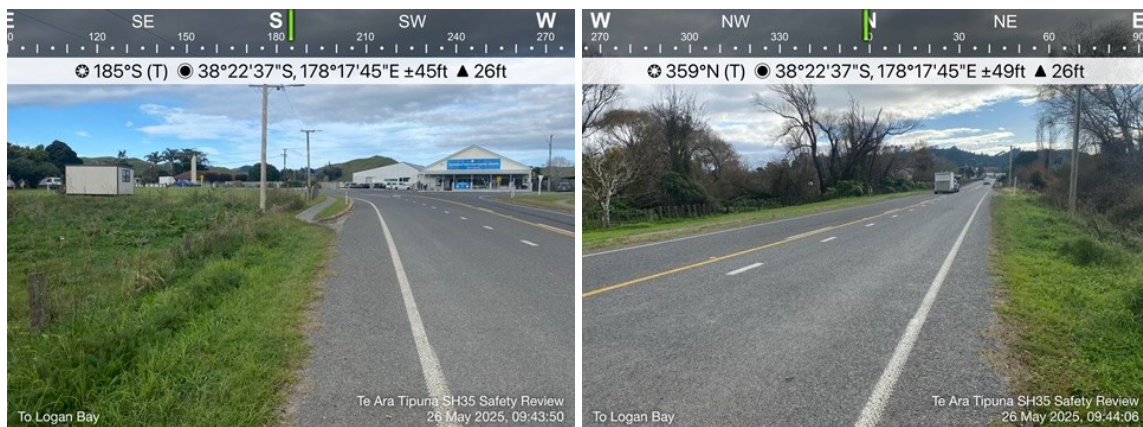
Location of proposed crossing on SH35 in Tolaga Bay (50 km/h speed limit); (looking south-left; looking north-right)
